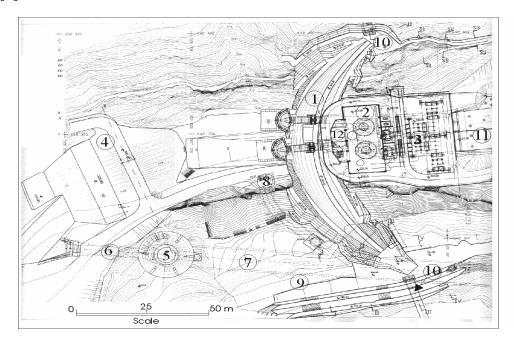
Disposition of dam St. Petka: 1 - dam; 2 - power station; 3 - switchyard; 4 - upstream cofferdam; 5 - spillway shaft; 6 - diversion tunnel; 7 - spillway tunnel; 8 - bottom outlet; 9 - access road; 10 - grouting gallery; 11- regulated river bed; 12- energy transformators [2]
